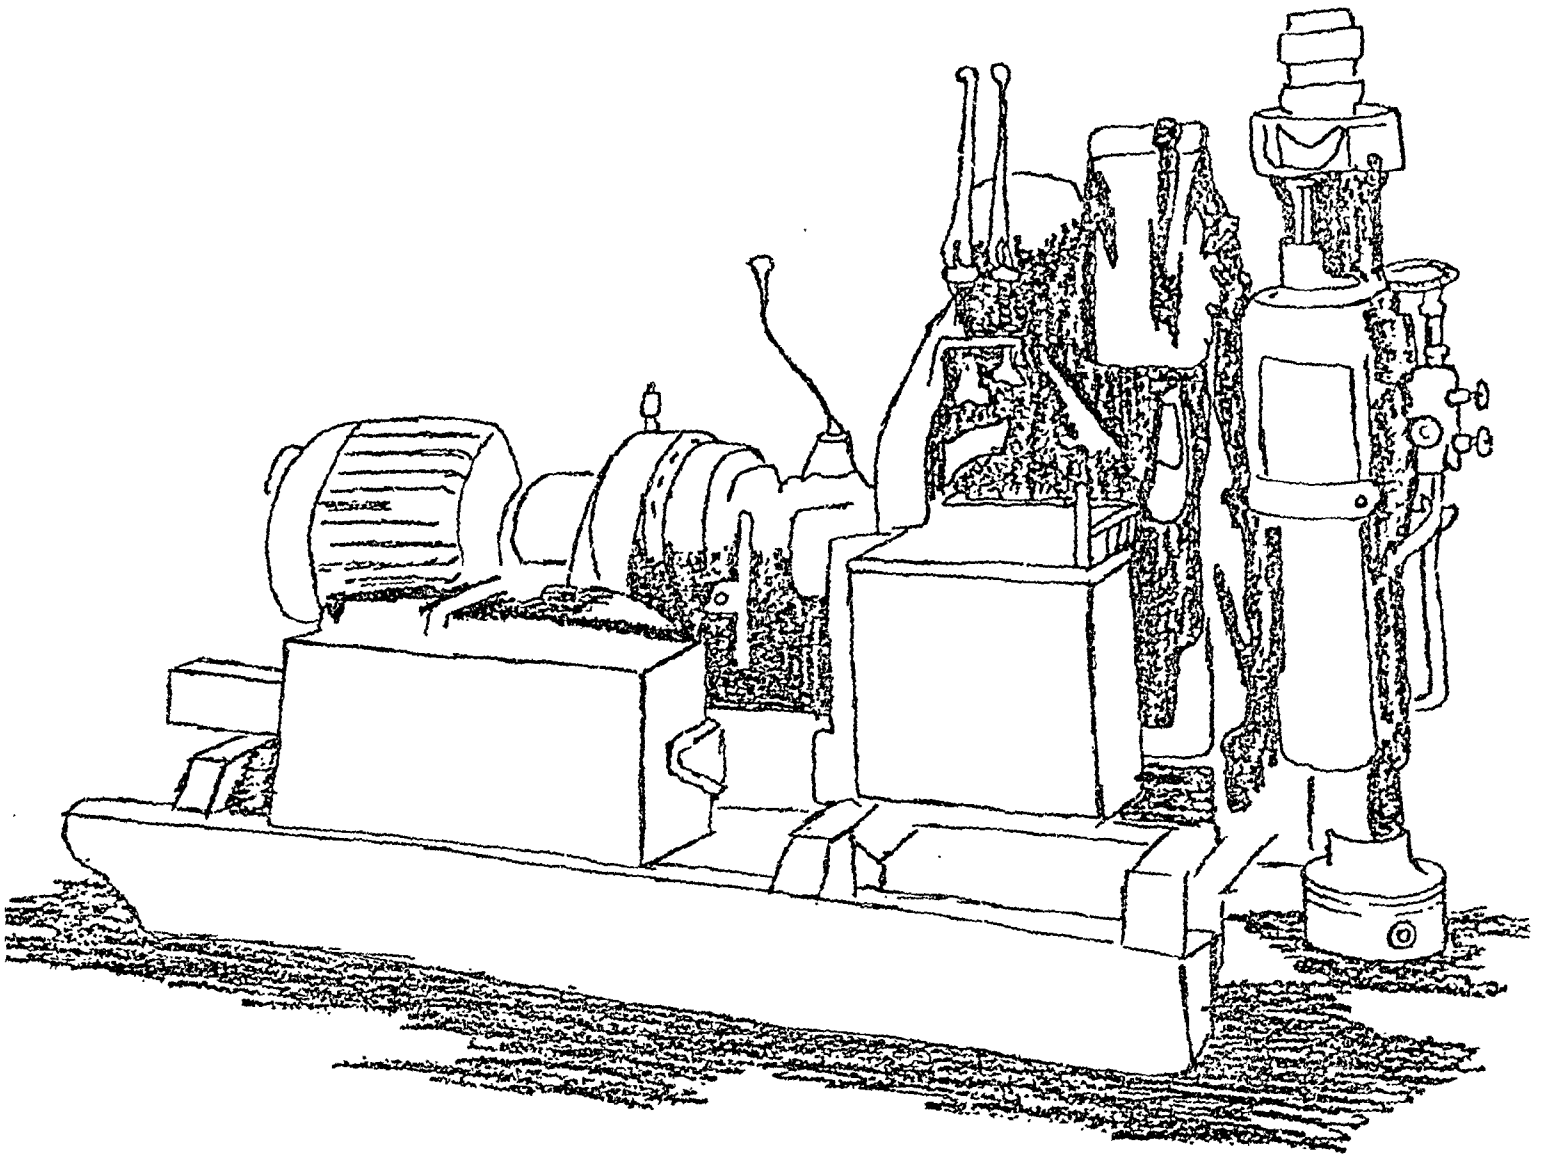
Electrically Driven, Skid Mounted Core Drill
